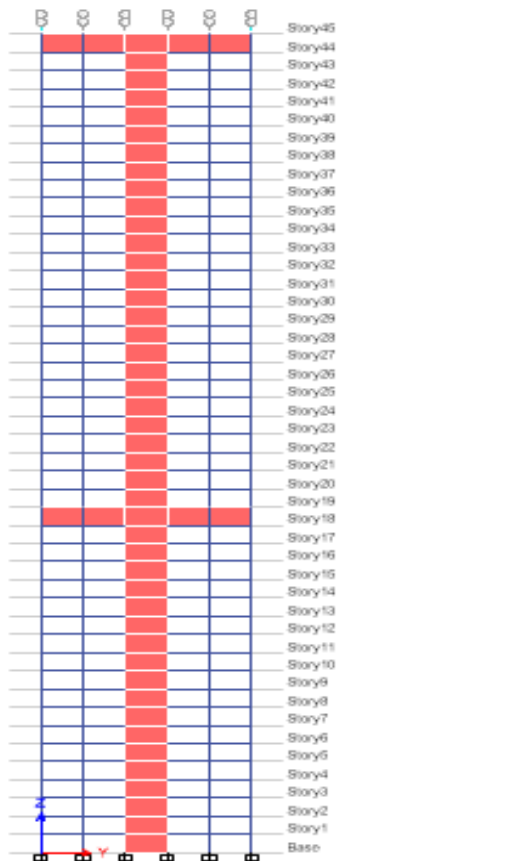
Structural model with 2 outrigger and belt truss system (SM 2)
